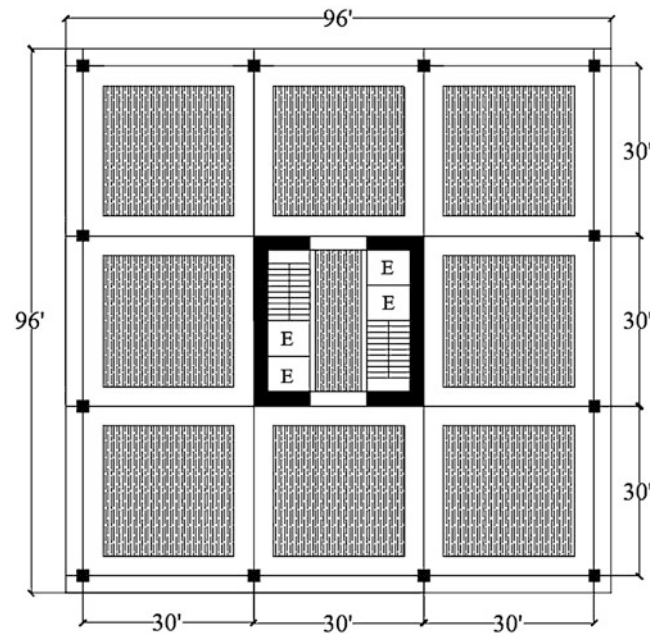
Typical floor plan of high-rise residential complex – green geometries represent wood inlays within slab
